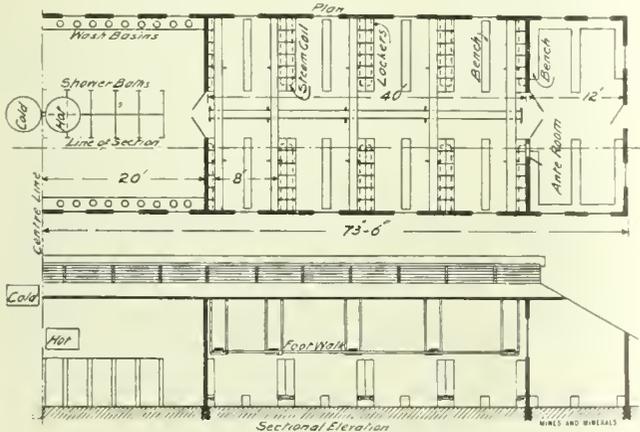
SUGGESTED PLAN FOR WASH HOUSE
